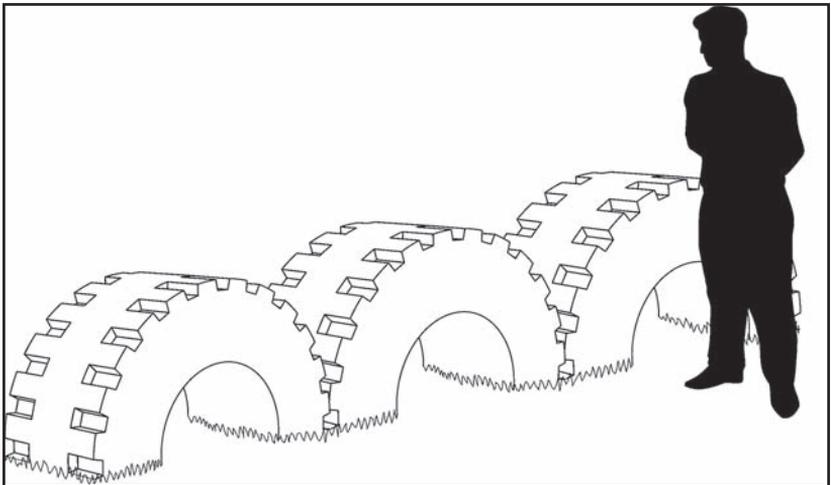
Typical Heavy Equipment Tire Barrier Construction (UFC 4-022-02)
